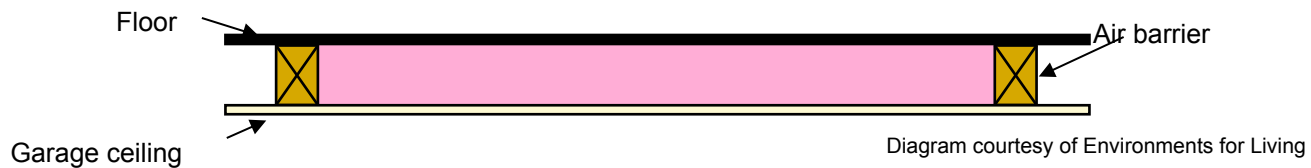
Alignment of insulation and air barrier at garage ceiling
